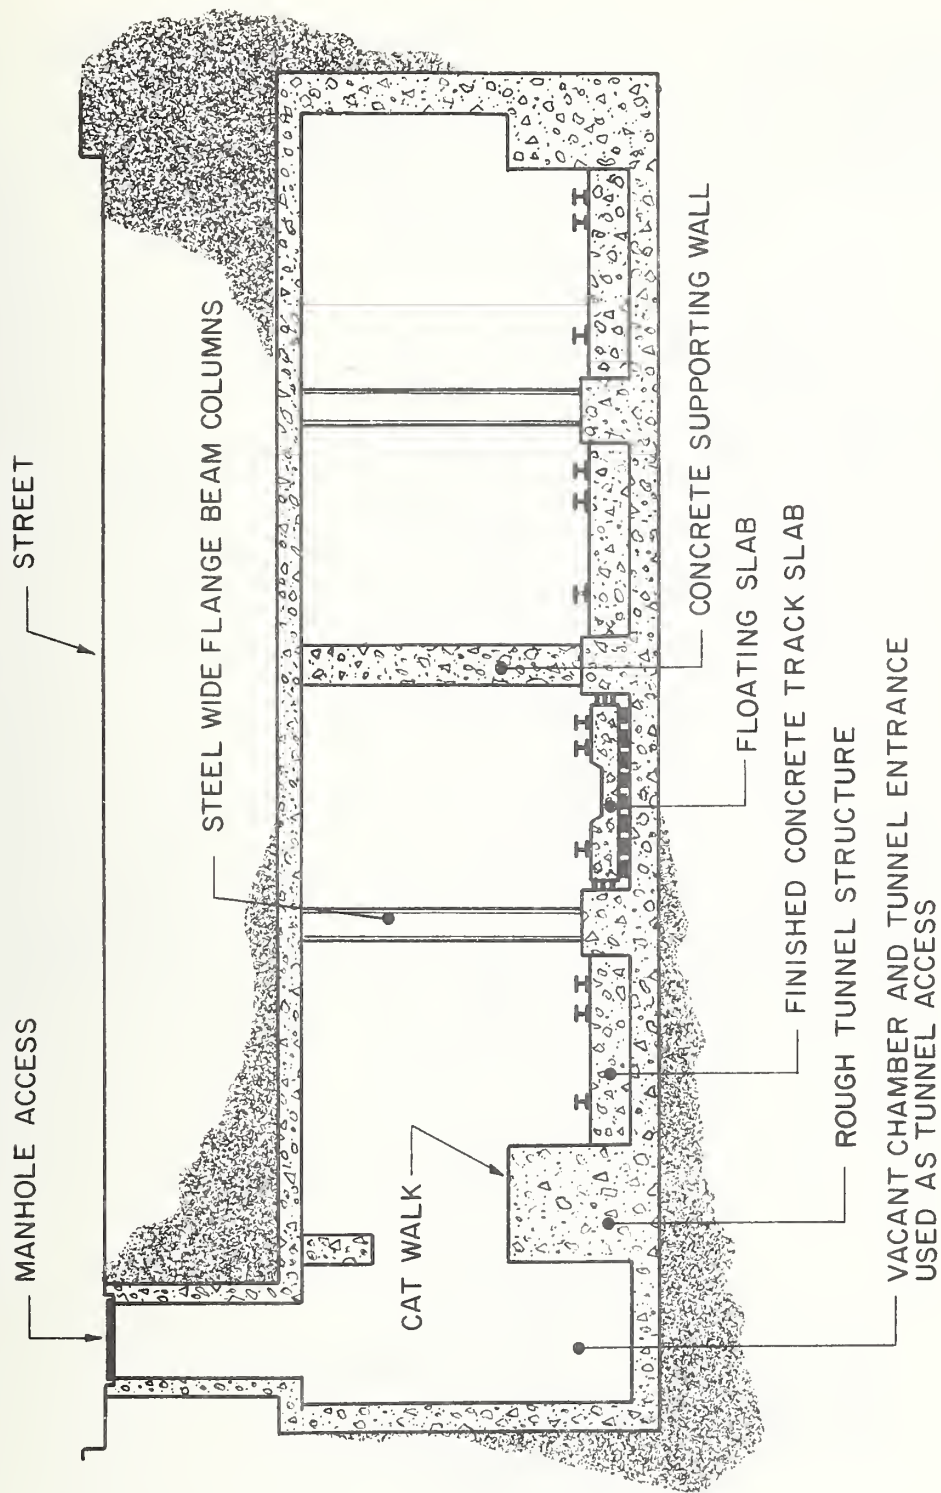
IND LINE TUNNEL CROSS SECTION SHOWING FLOATING SLAB AND TUNNEL ACCESS.
